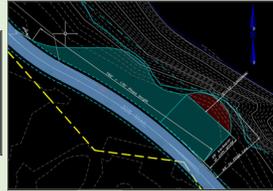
Plan view of the proposed design, drafted using Autodesk Civil 3D
